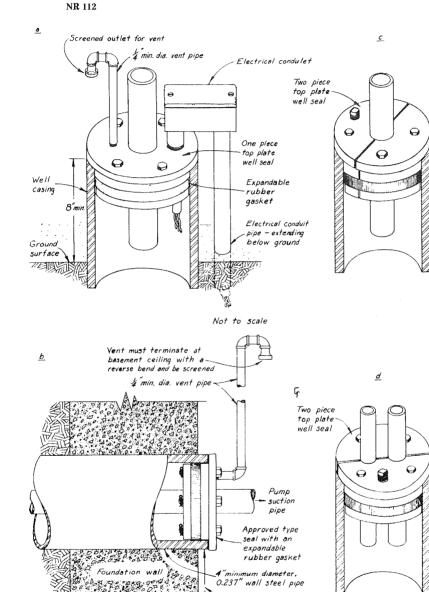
Types of Well Seals. (a) top of well seal using compressible rubber gashet. (c) and (d) also top of well seals with compressible rubber gaskets but with split top and bottom plates and gasket requiring acceptable housing protection. (b) nonpressure conduit seal using compressible rubber gasket. See NR 112.17(2) and (4).
